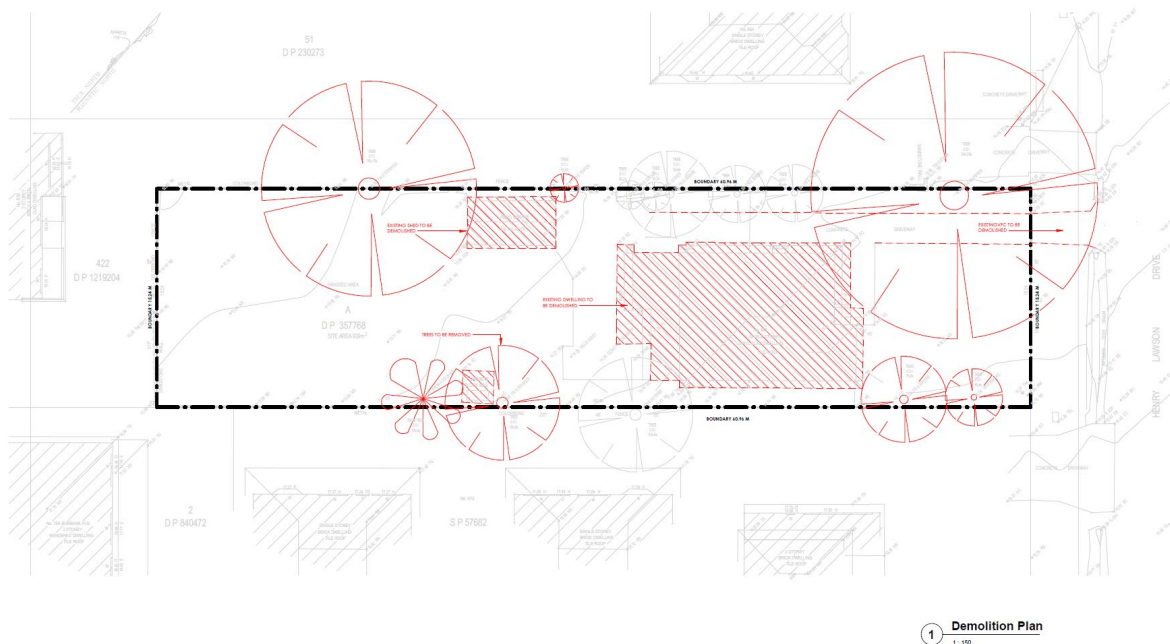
668 Henry Lawson Drive, East Hills NSW 2213 – Demolition Plan - Dezcon
